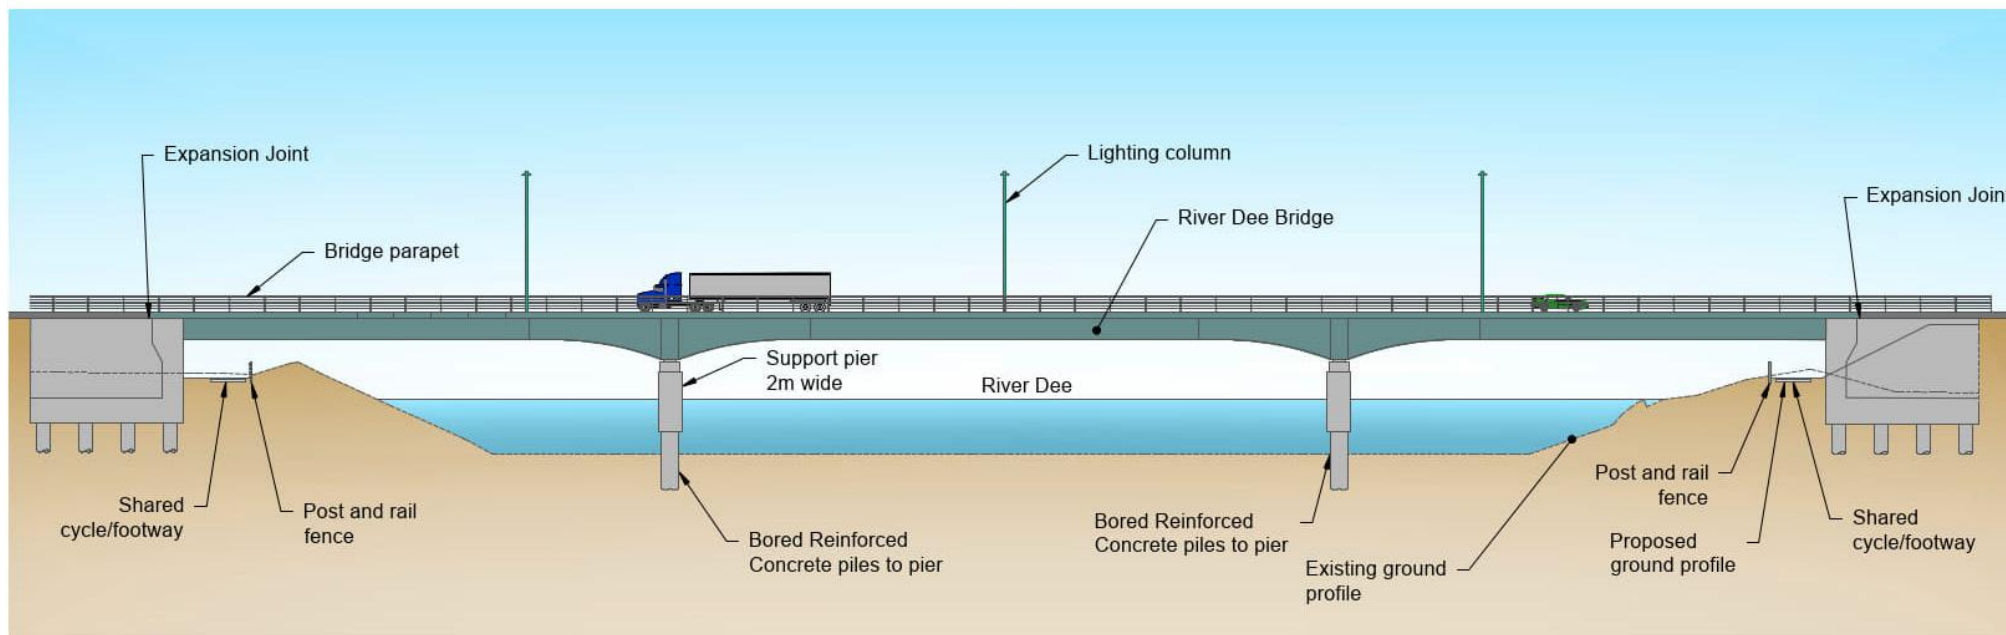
Typical long section of the new river bridge facing south east (*Source: Mott MacDonald*)
